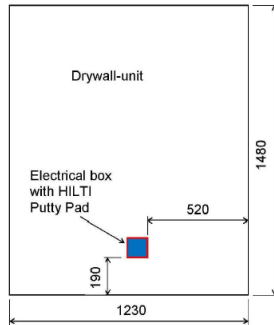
Variant 6: Electrical box 2 in drywall-unit (from receiving room)
